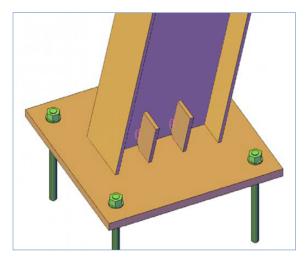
BASE PLATE JOINT WITH STIFFENERS
